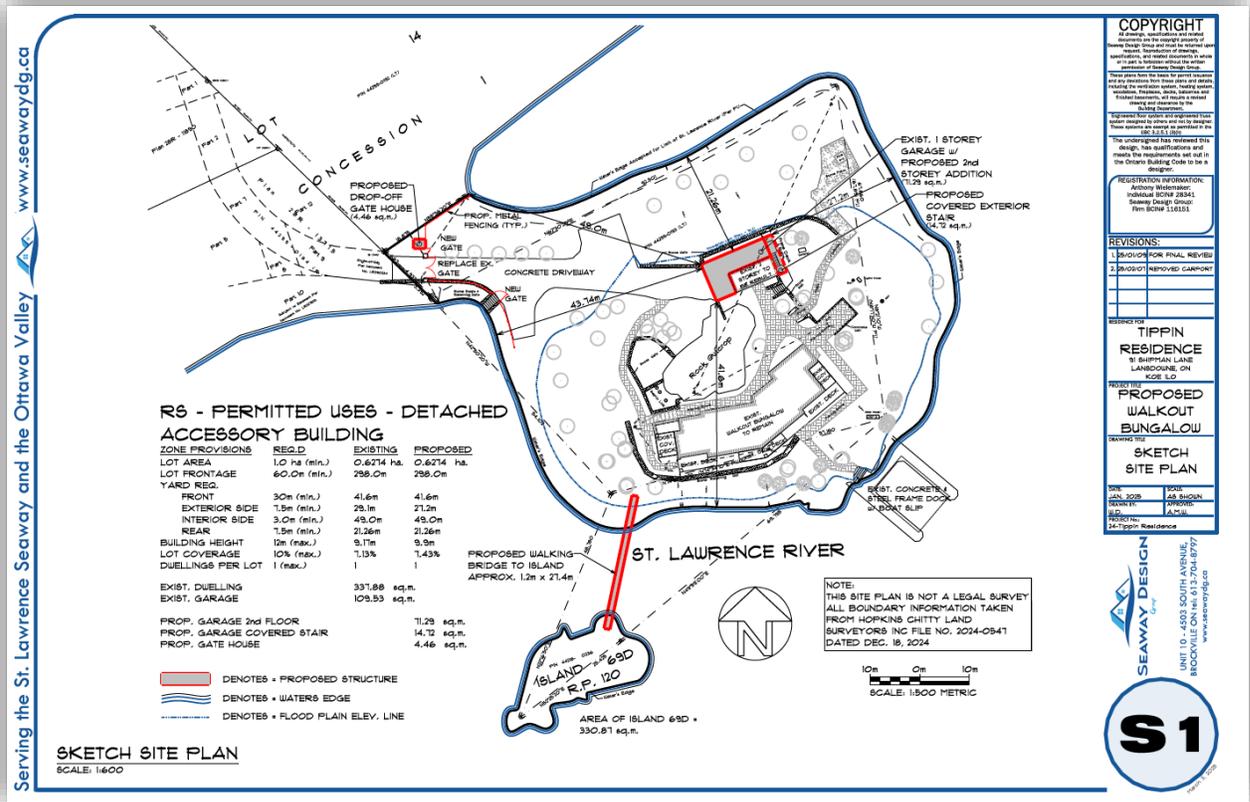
Site Plan and Proposed Development Layout for 91 Shipman's Lane
